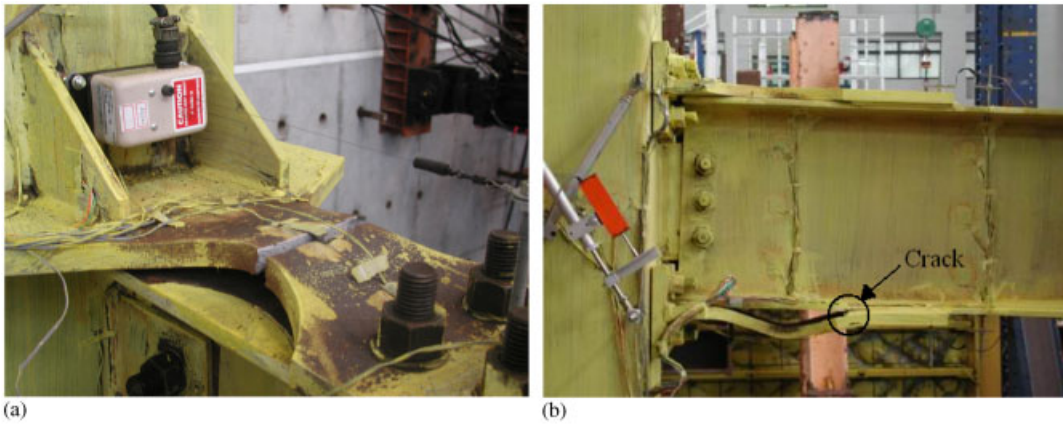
RFP failure modes in Specimens 2 and 3: (a) RFP fracture in Specimen 2 (-5% drift) and (b) weld crack between bottom RFP and Specimen 3 beam flange (-4% drift).
